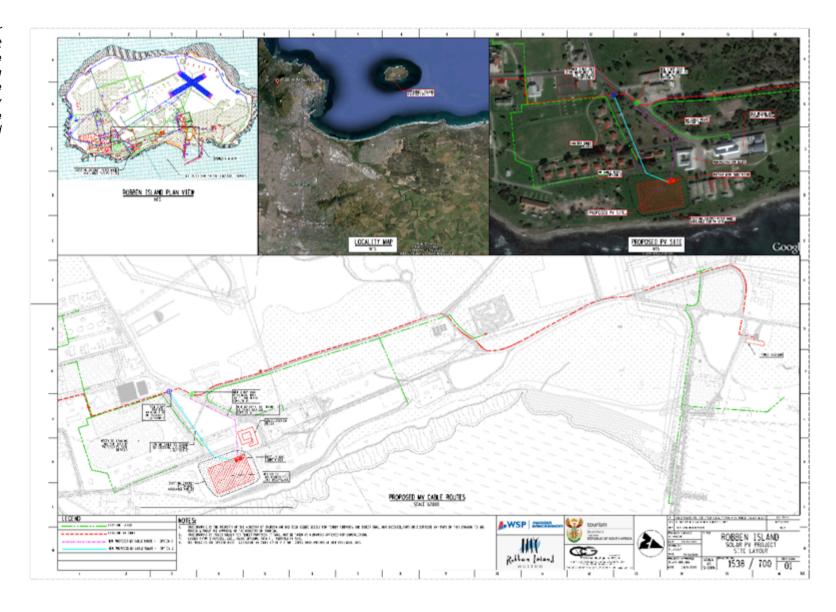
Site layout detail for installation of new power cables (As provided by WSP|PB, January 2016)
